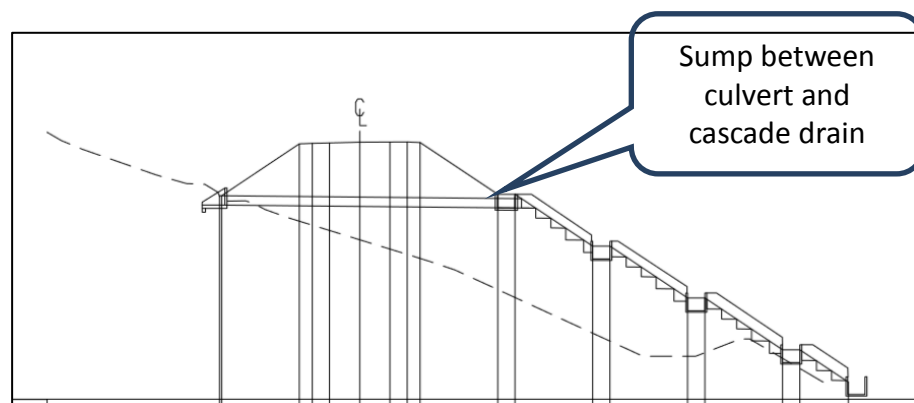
Proposed cascade drain at culvert outlet and control the IL.
